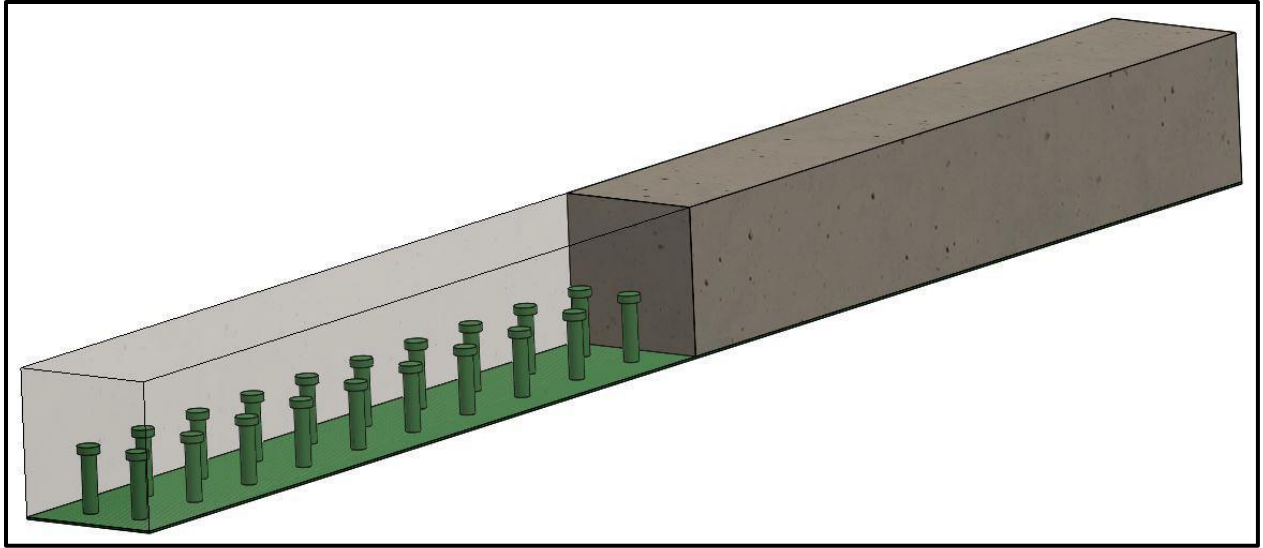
Flat Panel Beam Model with Shear Studs and Concrete [4]
